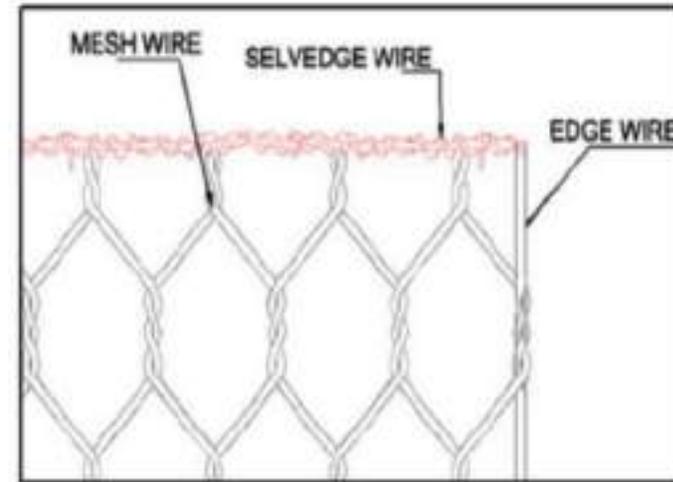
4 Mechanically Selvedging and Edge Wire
